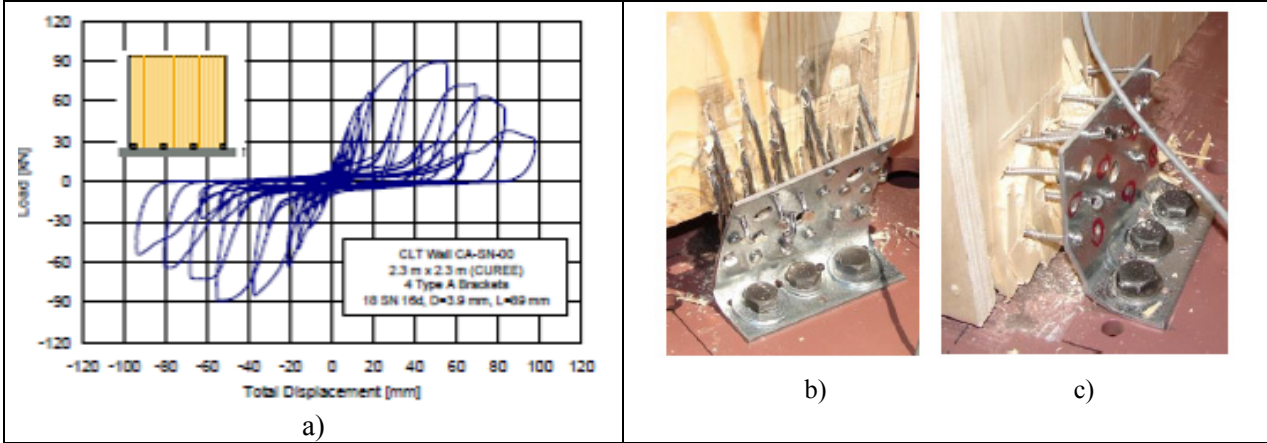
(a) typical hysteretic behaviour of a CLT wall, (Popovski and Karacabeyli 2011); typical damage to angle brackets and fasteners b) during testing, c) following testing (Popovski et al. 2010) (images courtesy of M. Popovski)
